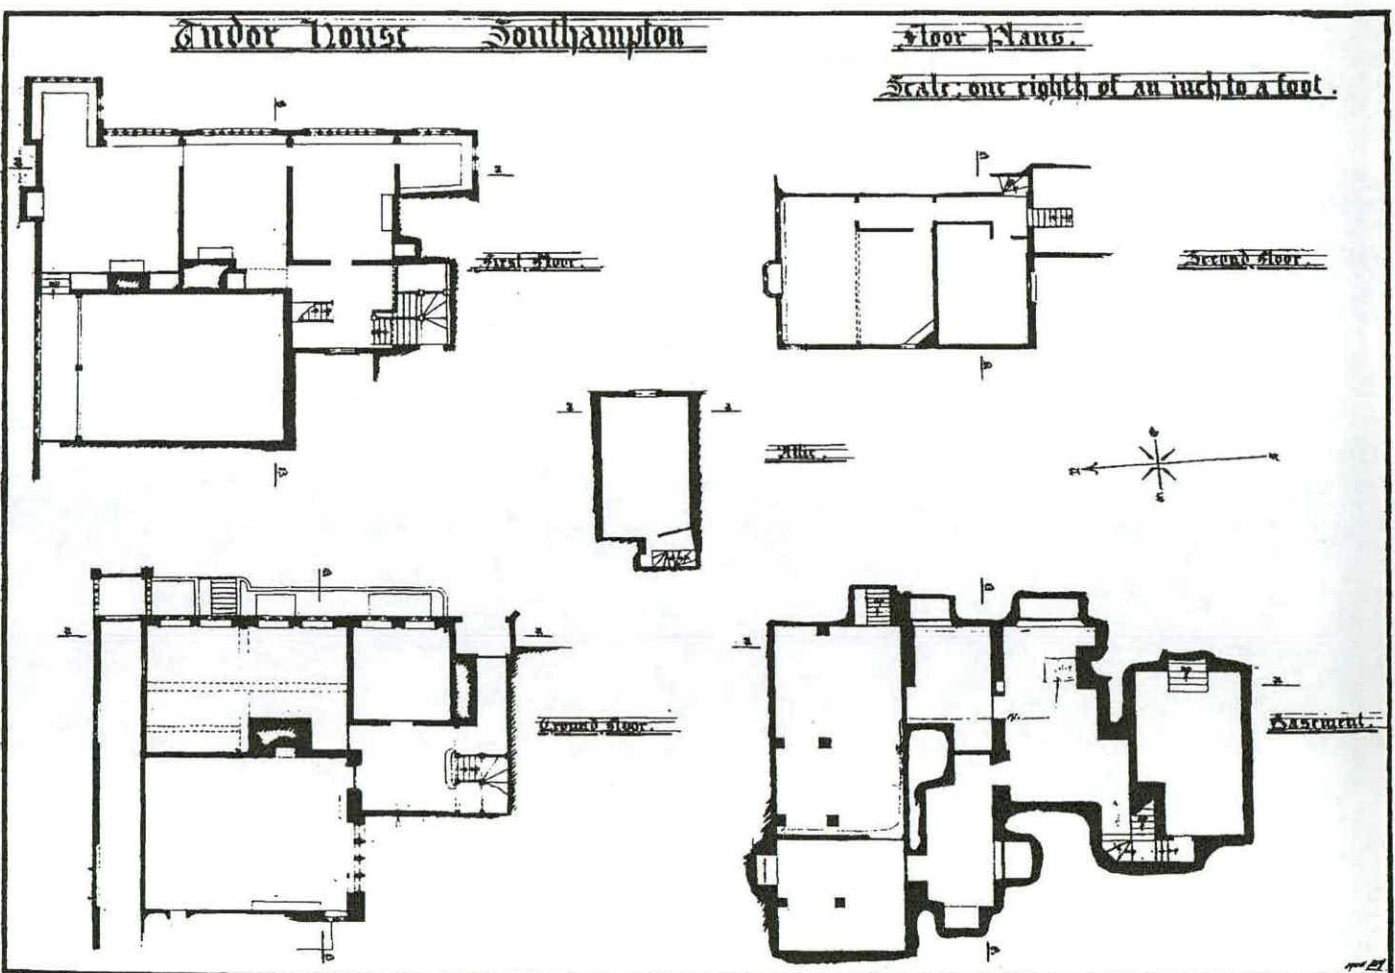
, Tudor House, Southampton, floor plans, scale: one eighth of an inch to a foot, 1905 (SC/EN4/24/19A, 1269, SRO)
